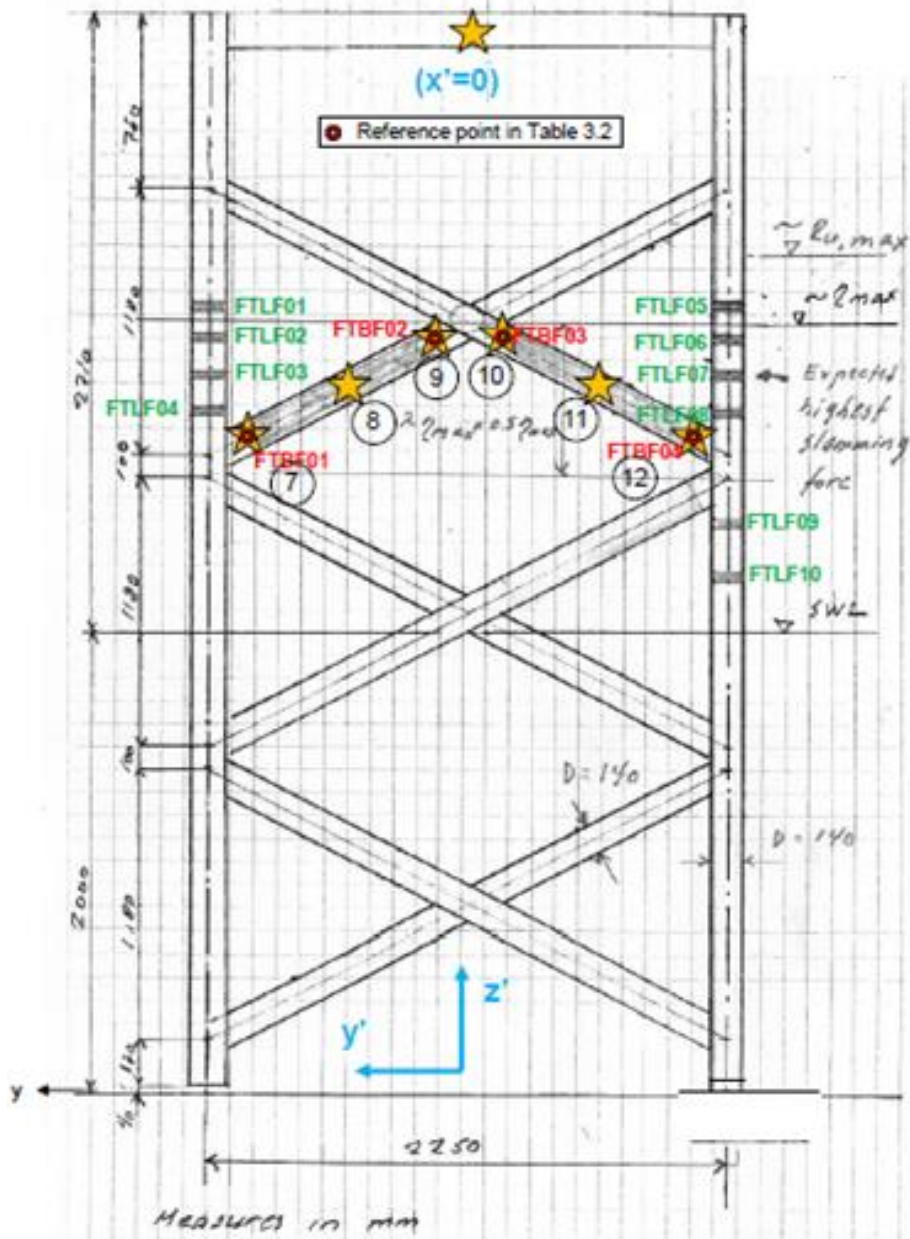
Front view of the structure. Location of the transducers on the bracings and columns.
